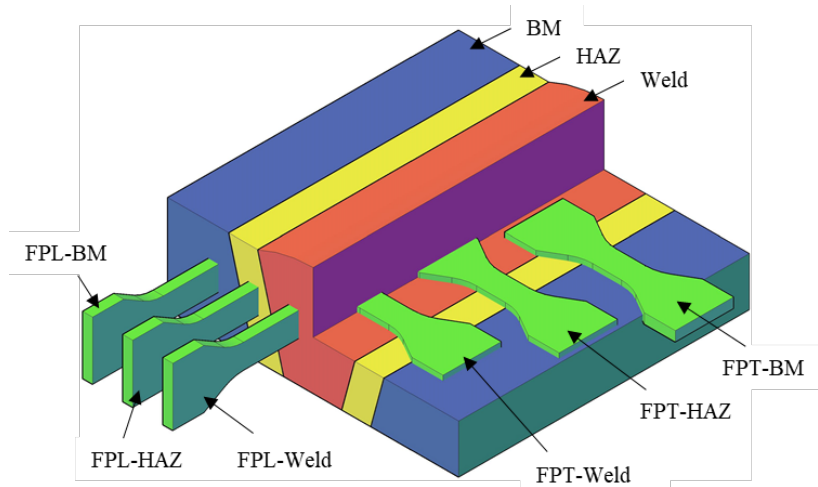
Location and direction of flat plate (FP) coupons extracted from the butt-welded plates.
